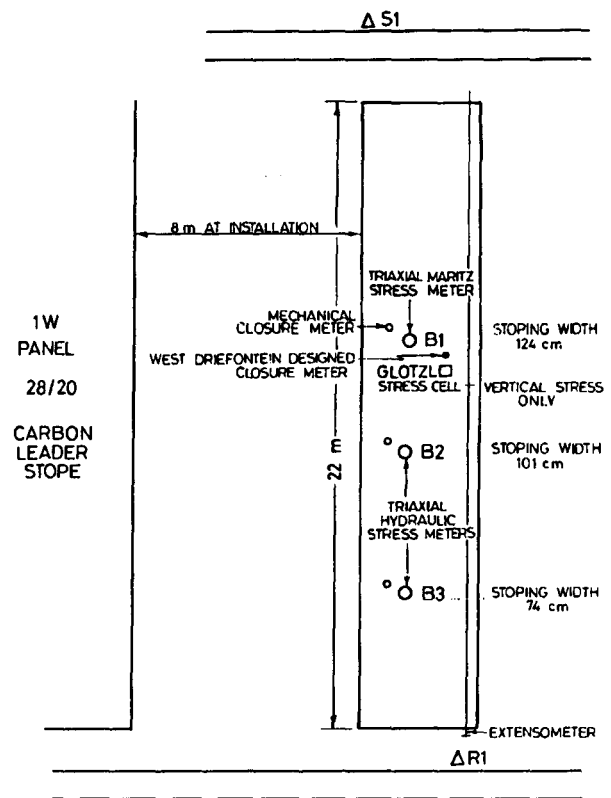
Layout of instrumentation in backfill paddock in panel 1W
